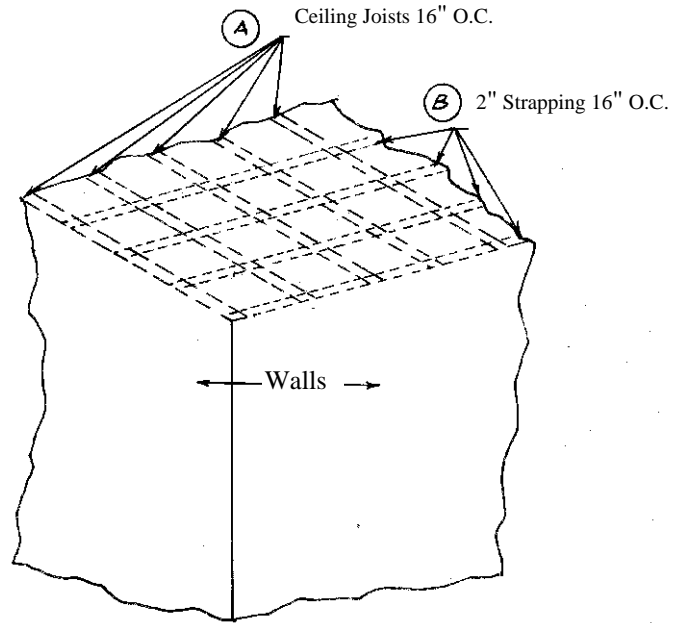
Fastening the ceiling plate to the ceiling joists above it
